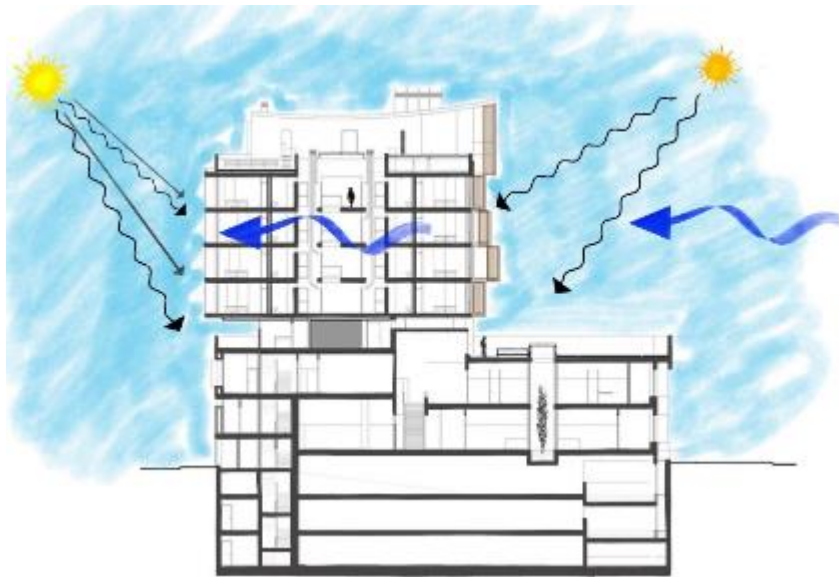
Plaza de America building cross section showing winter and summer sun angles and prevailing wind exposure. Illustration by Allan Colpitts
